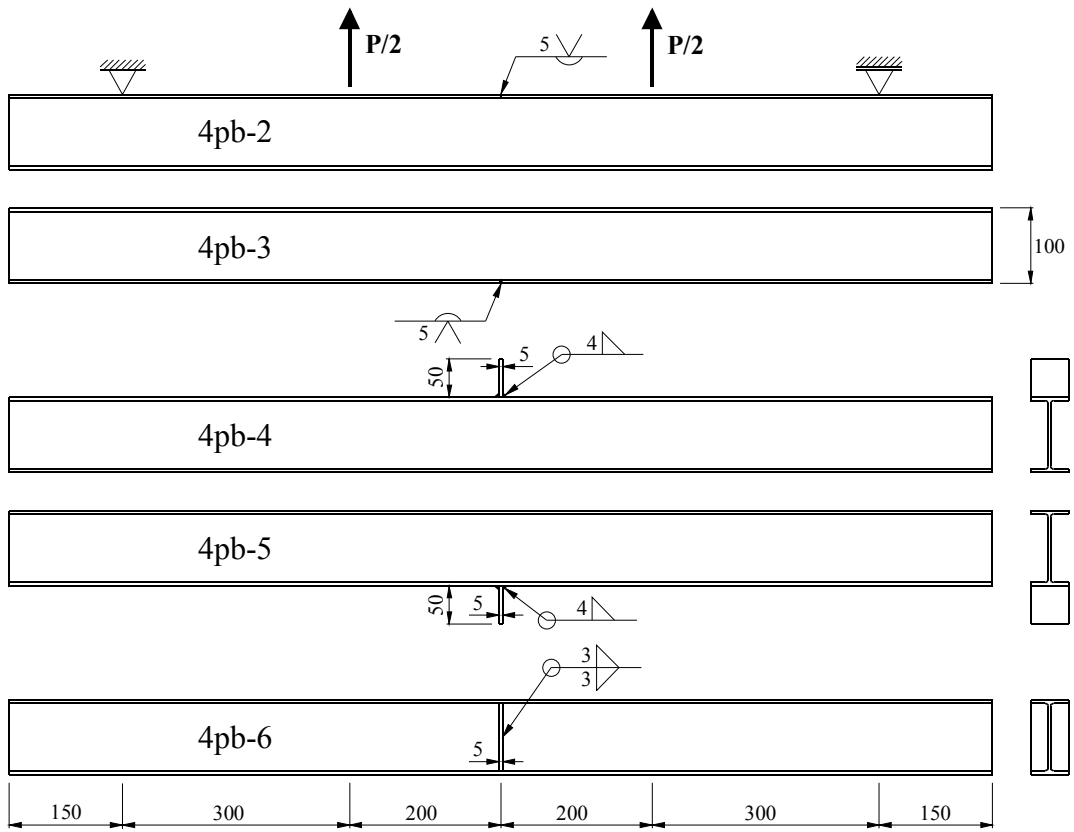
Geometry of the welded members (Matusiak 1999).
